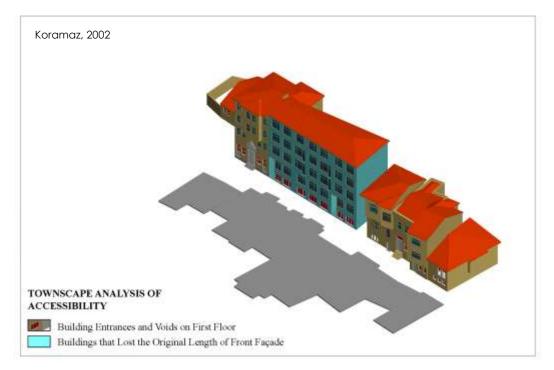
Townscape Analysis of Accessibility on Right Façade of Fazilet Street
